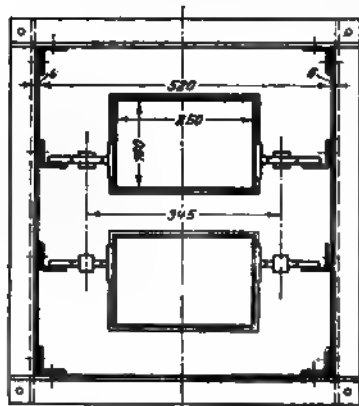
Cross Section of Elevator shown in Figs. 965 and 966.
